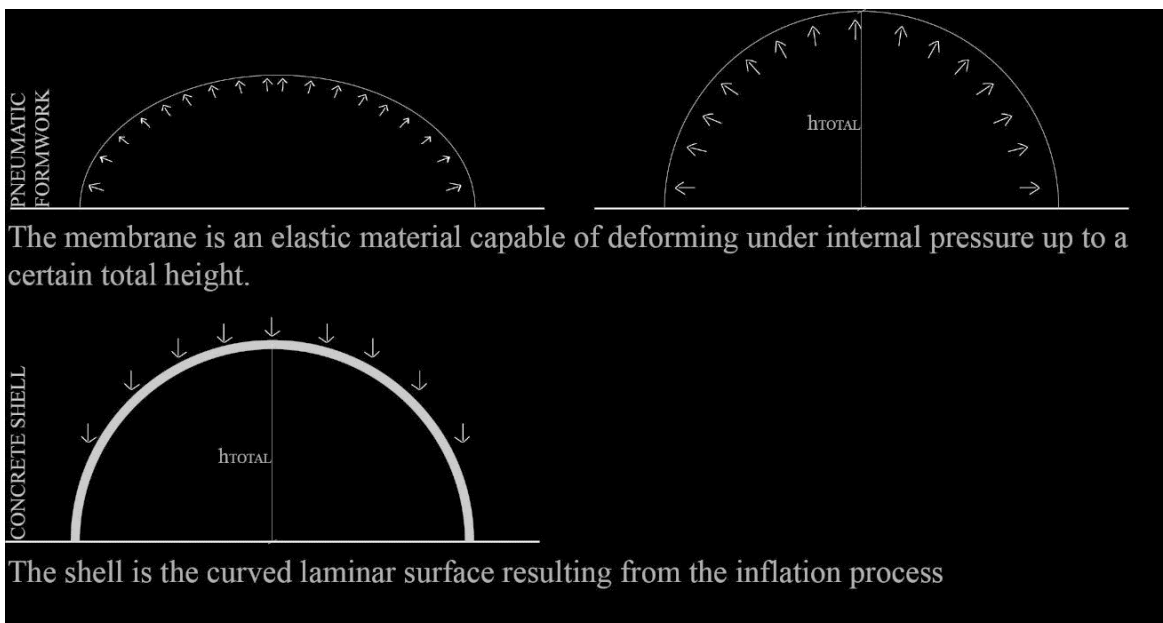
Pneumatic formwork and concrete shells, scheme system definition.
